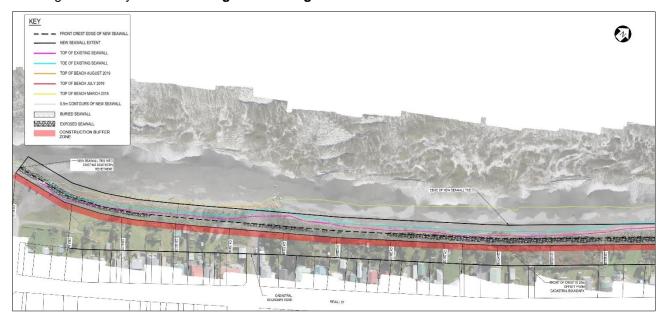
Draft design for proposed seawall extension (Stafford Street to Tudor Street) with added construction buffer zone (Image Source: Beca Design Documents, 23 December 20201)
